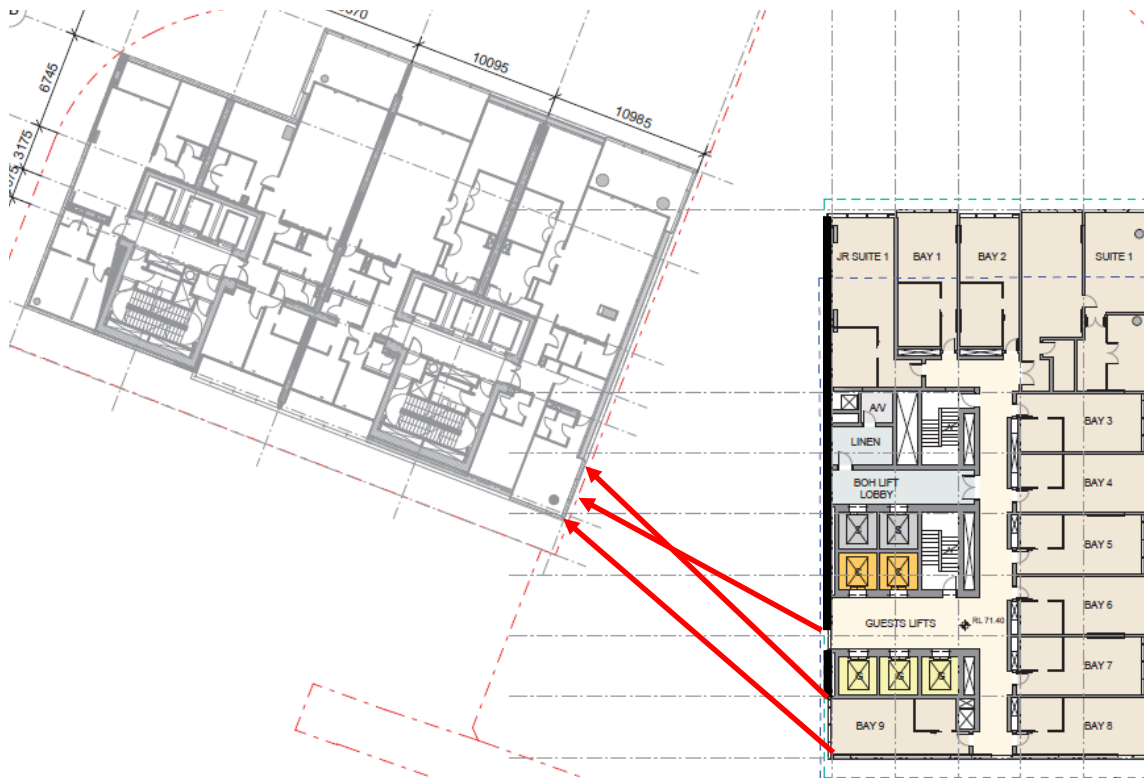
Separation distances between habitable rooms located on the eastern elevation of Tower and windows on the western elevation of Tower B (RL 85.0)
